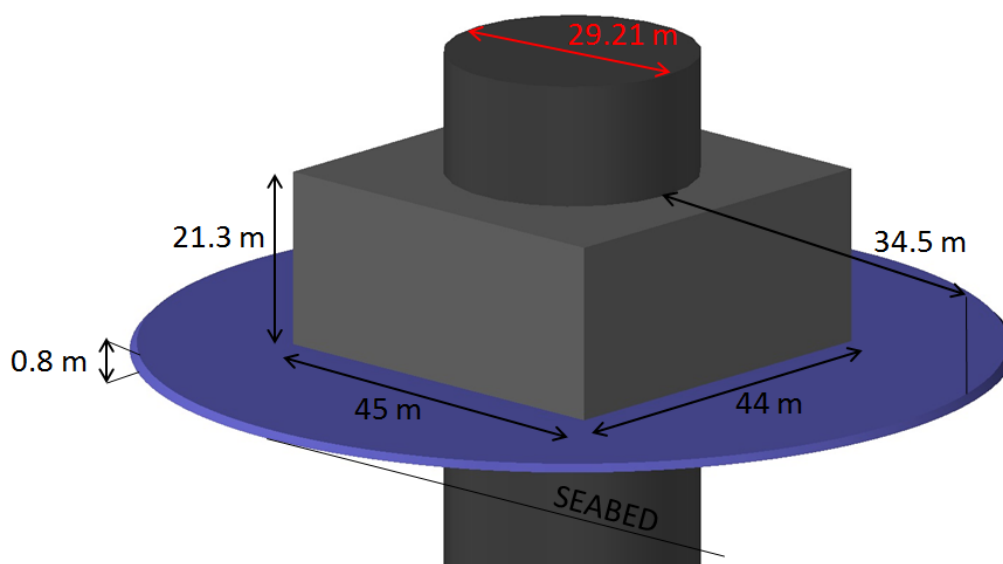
3D Rendering SW Anchor Scour Protection Equivalent Pier
